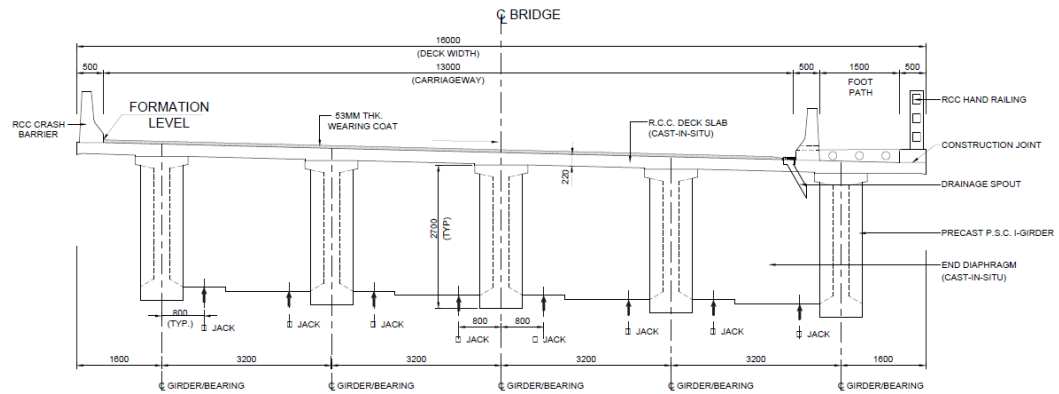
18 Cross section of 45m span OC post tensioned I girder at support
